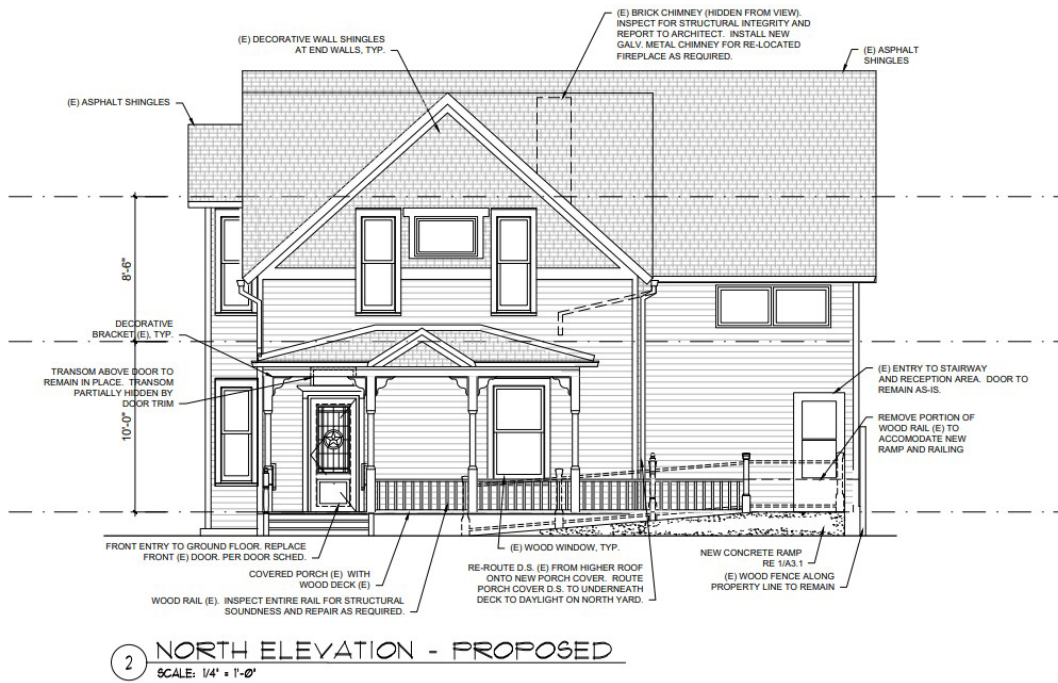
Proposed designs on north elevation highlighted, 2506 W. Alamo Ave.
